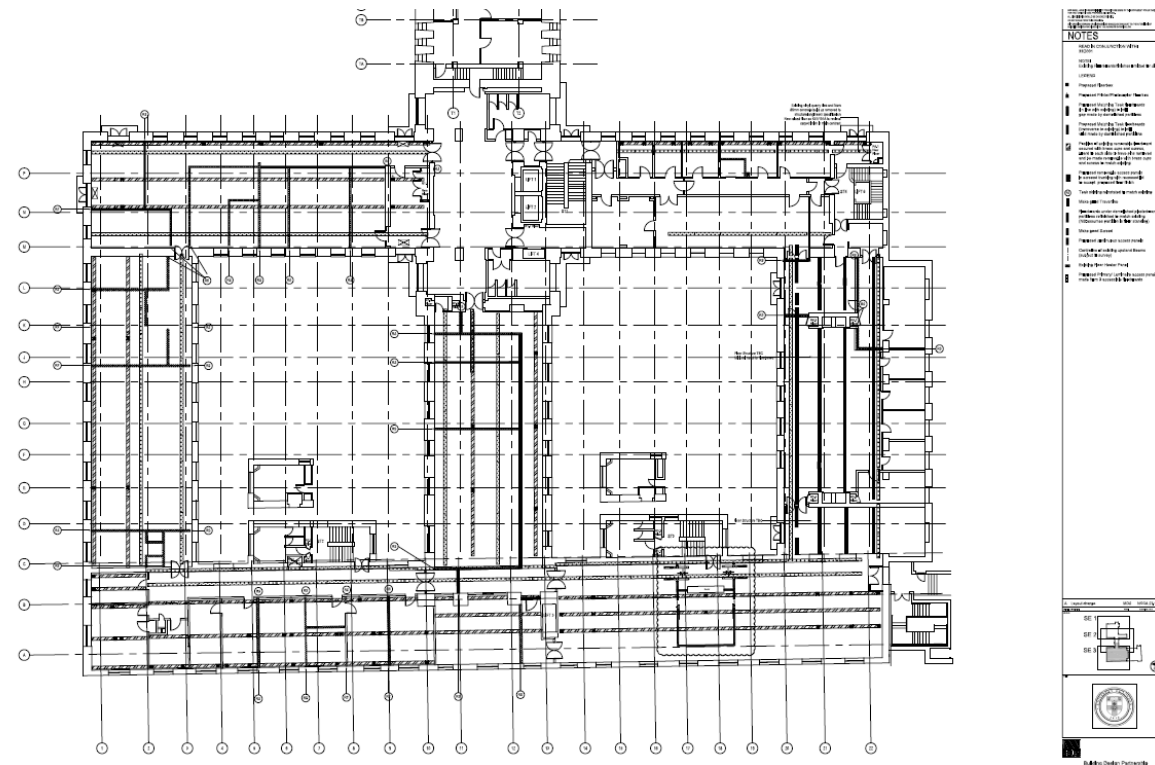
A drawing of the 2007 application (2007/0153/L) showing the proposed 'sub-floor' plan on the third floor. Source: Camden Planning Portal.
